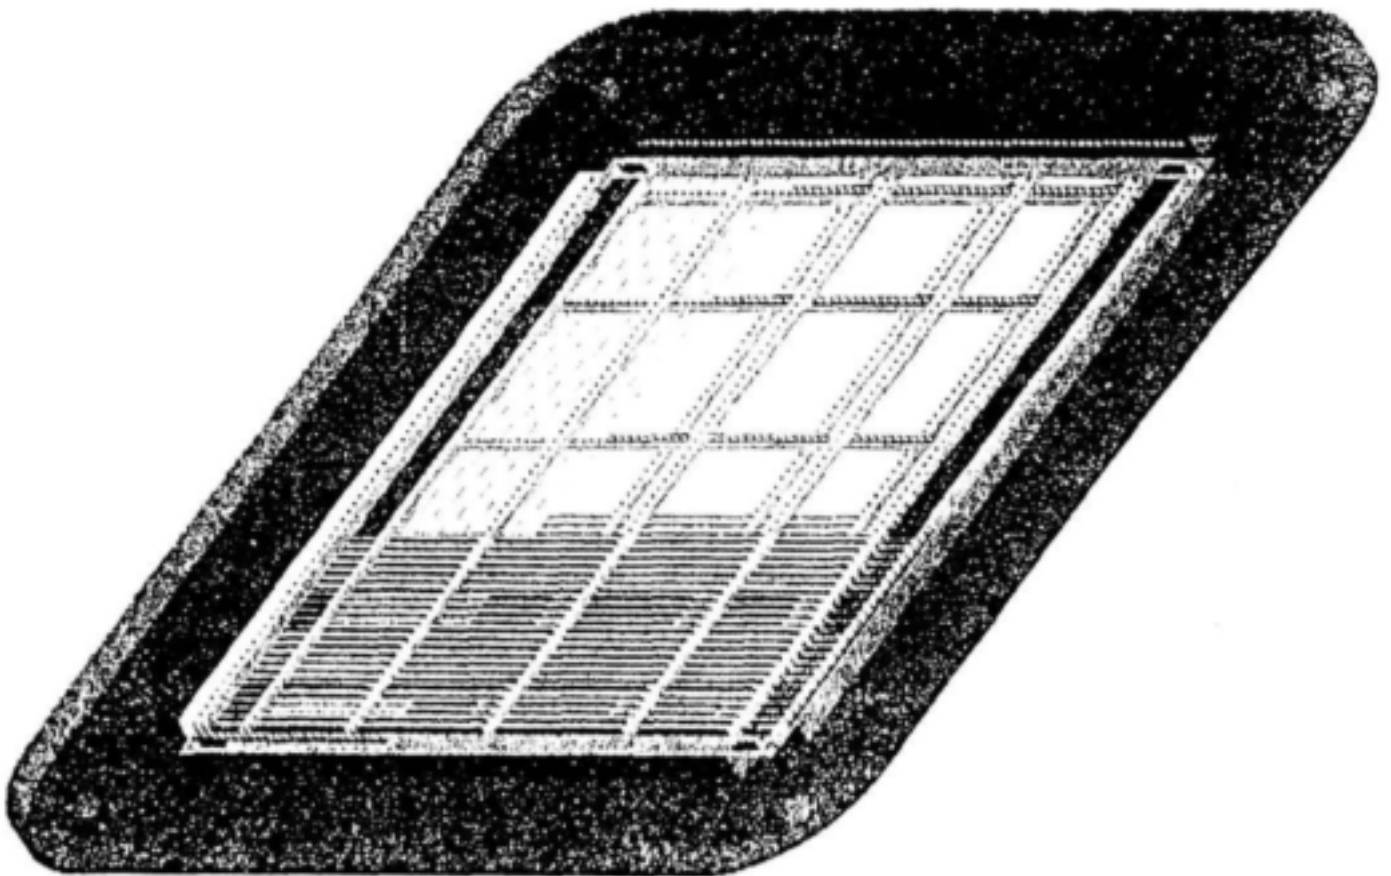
3-DIMENSIONAL DWG ILLUSTRATING THE SIMPLIFIED MODULE ASSEMBLY METHOD .
